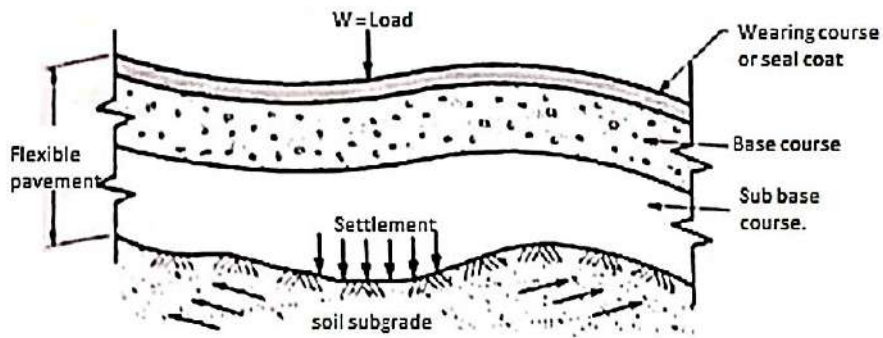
Subgrade Failure of Flexible Pavement [26]
